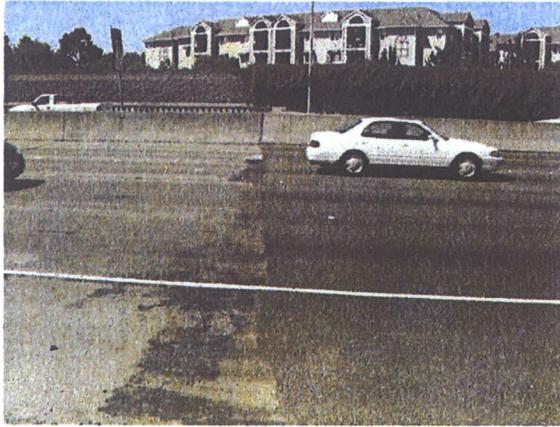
San Francisquito Creek Bridge (Bridge No. 35-0013) north deck joint (no suspect materials)
